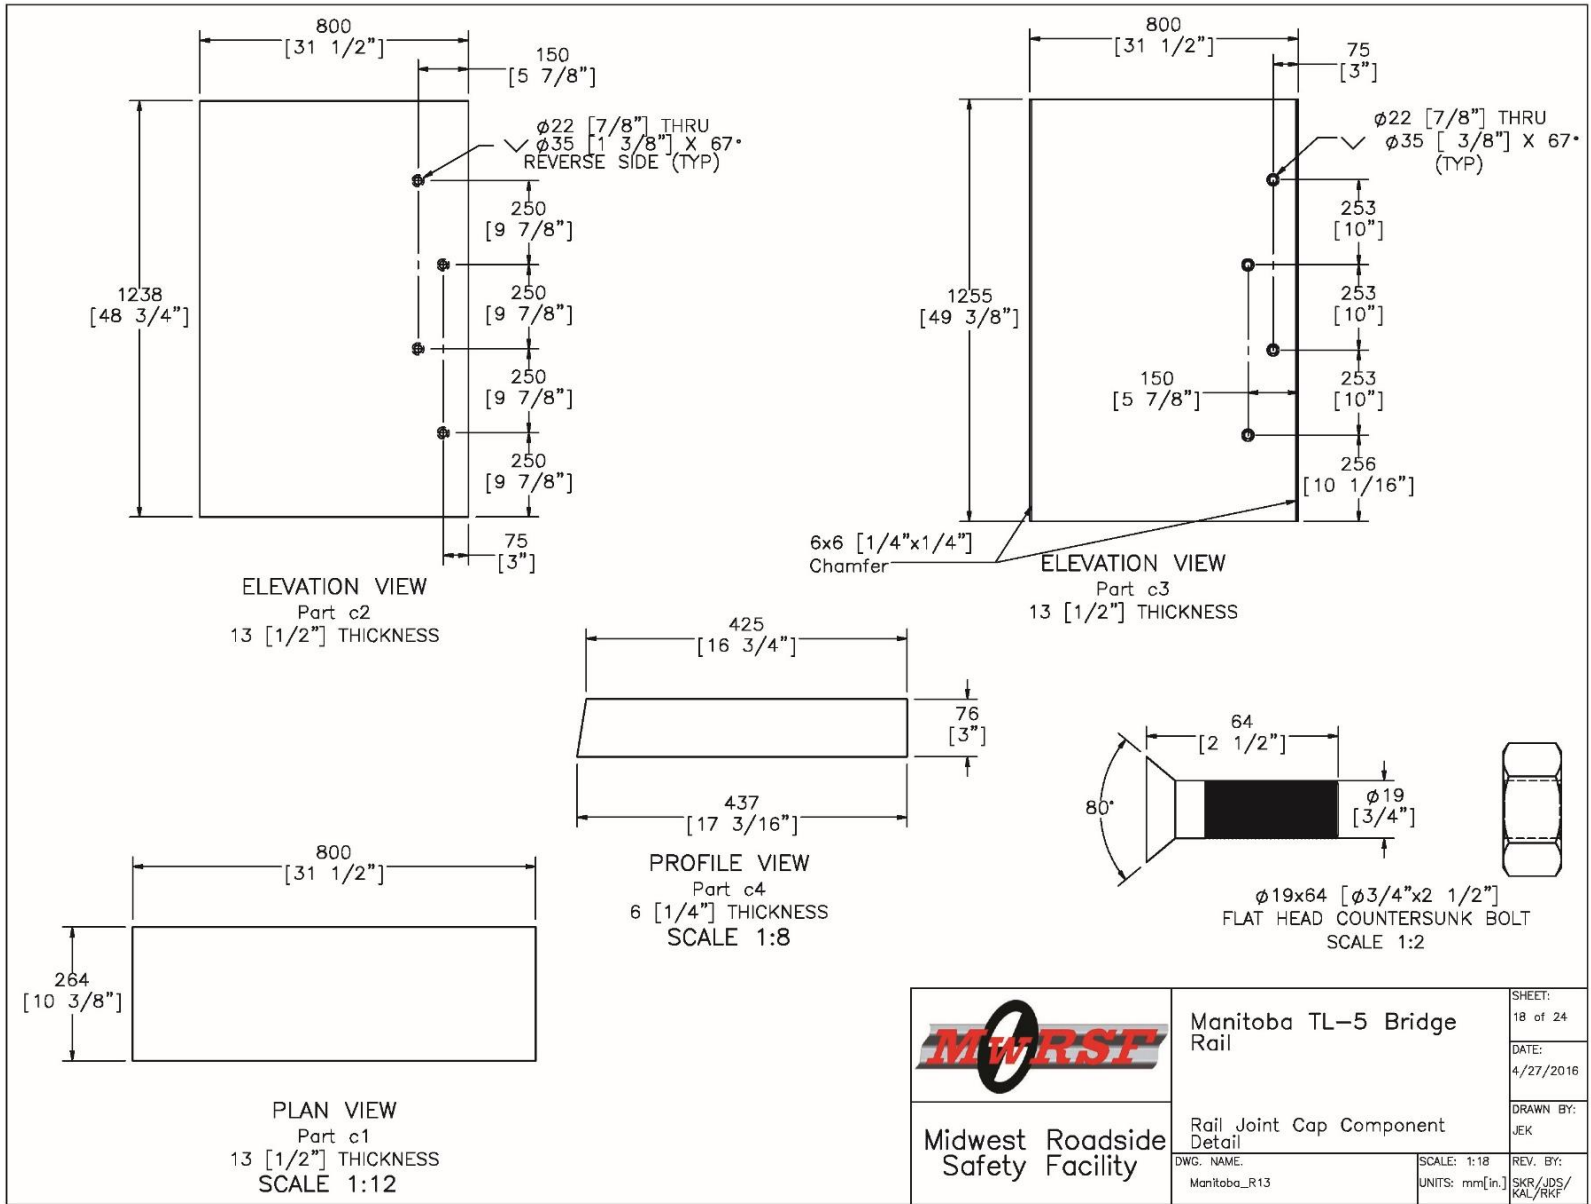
Rail Joint Cap Component Detail, Test No. MAN-1
